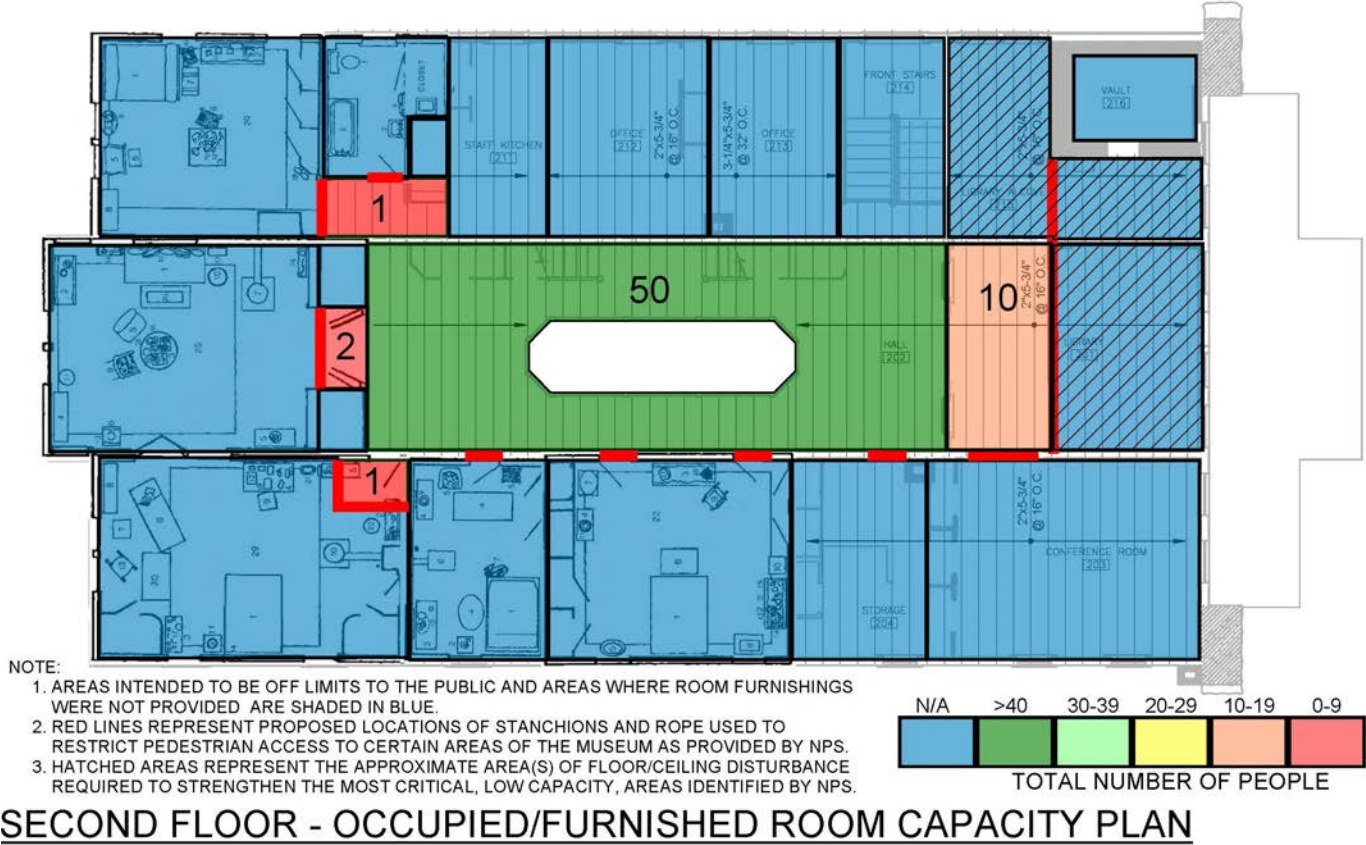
Furnished Room Capacity Plan - Second Floor
